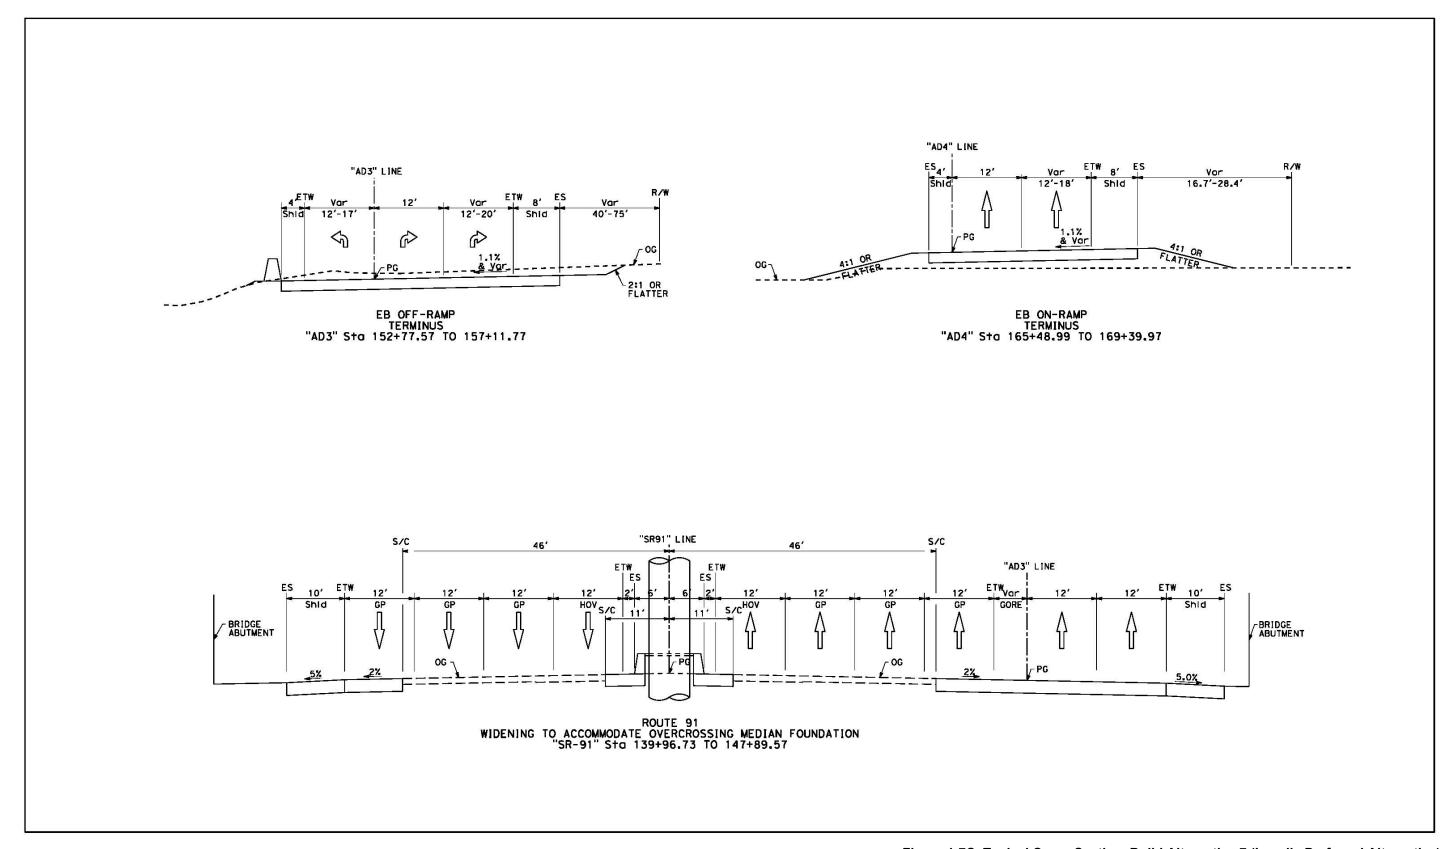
C. Typical Cross Section, Build Alternative 7 (Locally Preferred Alternative)
